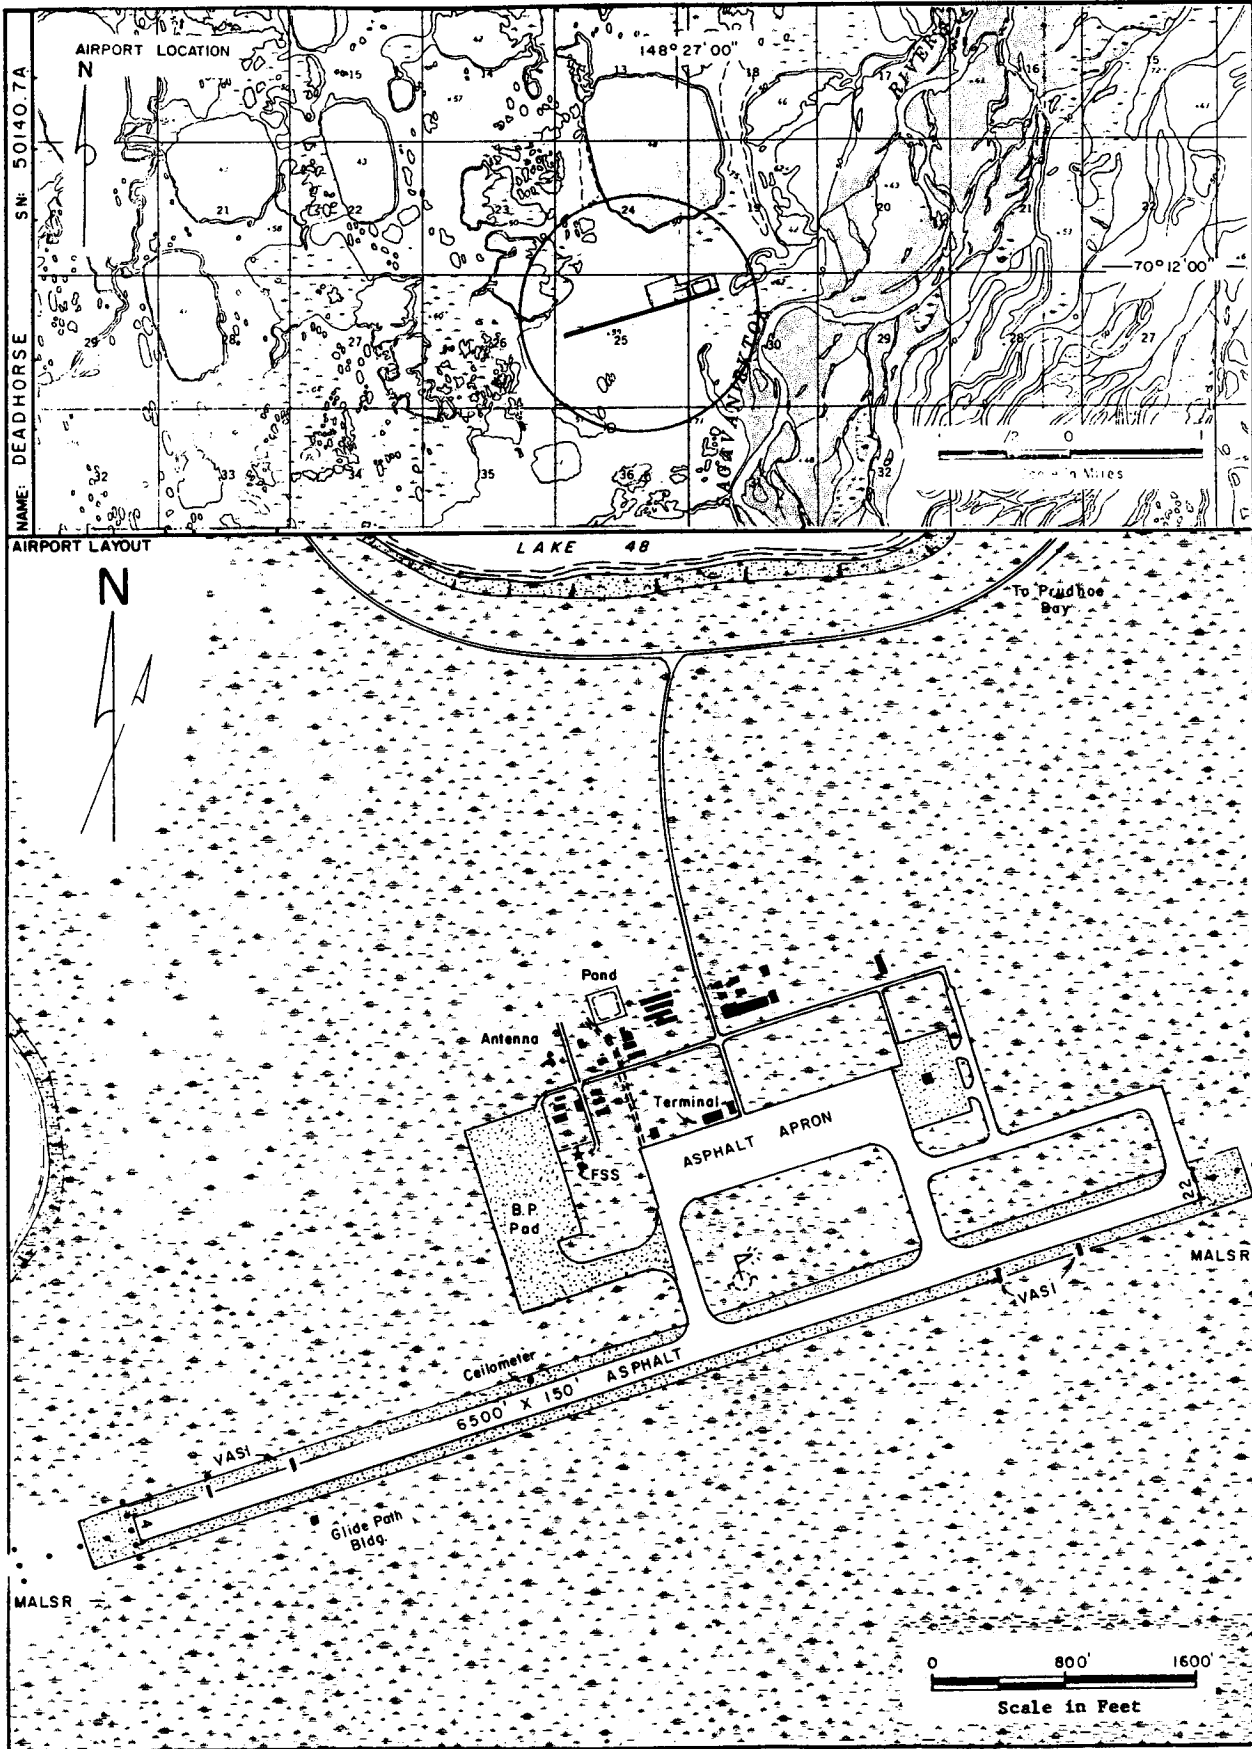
FAA MASTER PLAN - DEADHORSE AIRPORT LAYOUT
